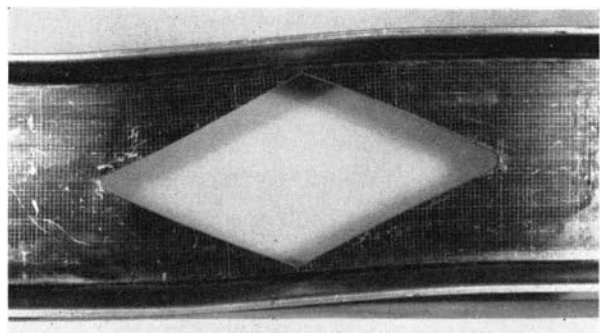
Center Loading Failure of 6-in. I-Beam with Diamond-Shaped Cutout
